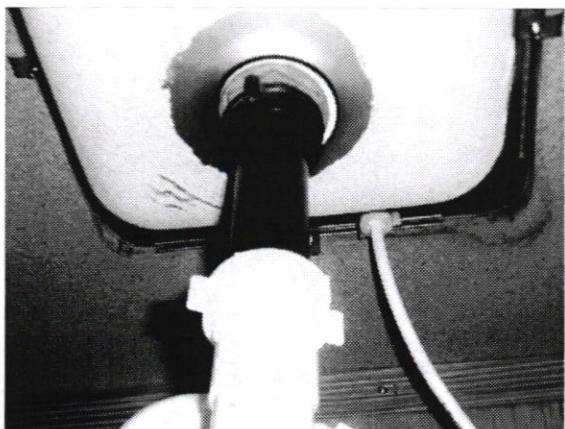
View of HA No. 01 – rubber floor glue located in the kitchen extension of the pharmacy building (ND)
